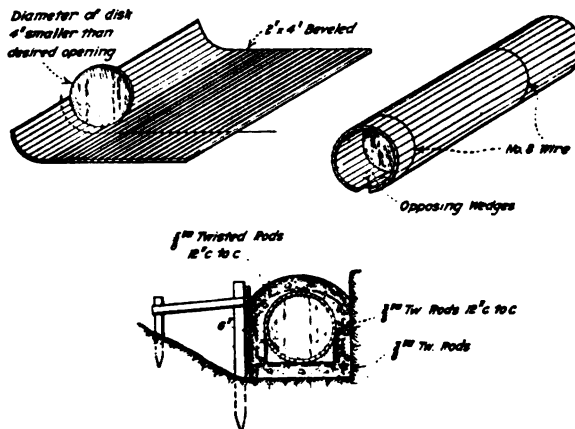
Collapsible, adjustable wood form for concrete culverts from 18 to 48 in. diameter.
